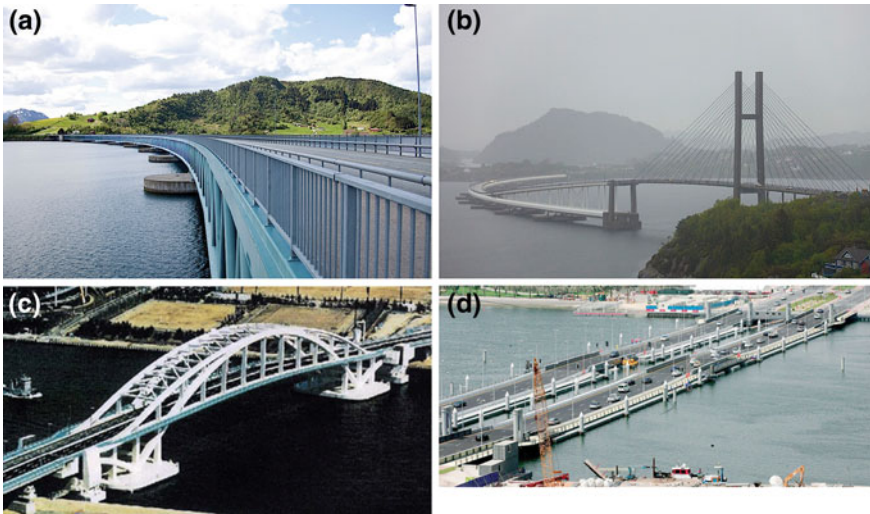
a Bergsøysund bridge (Photo courtesy Erik Johan Bjertnæs, <http://bridge-info.org/>) b Nordhordland bridge (Photo courtesy Erik Johan Bjertnæs, <http://bridge-info.org/>) c Yumemai Bridge d Dubai floating bridge (Photo courtesy Shihab, <http://www.khaleejtimes.com>, July 2, 2013)
